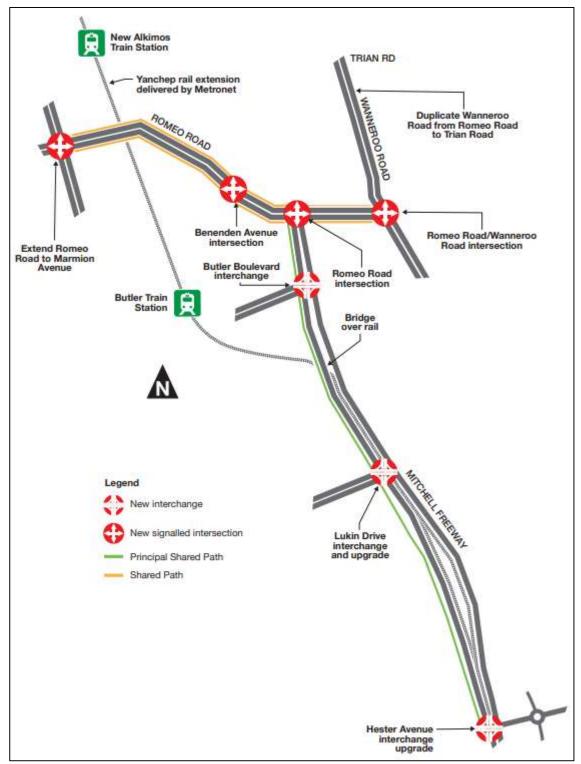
Extension Mitchell Freeway Plan Source: MRWA
